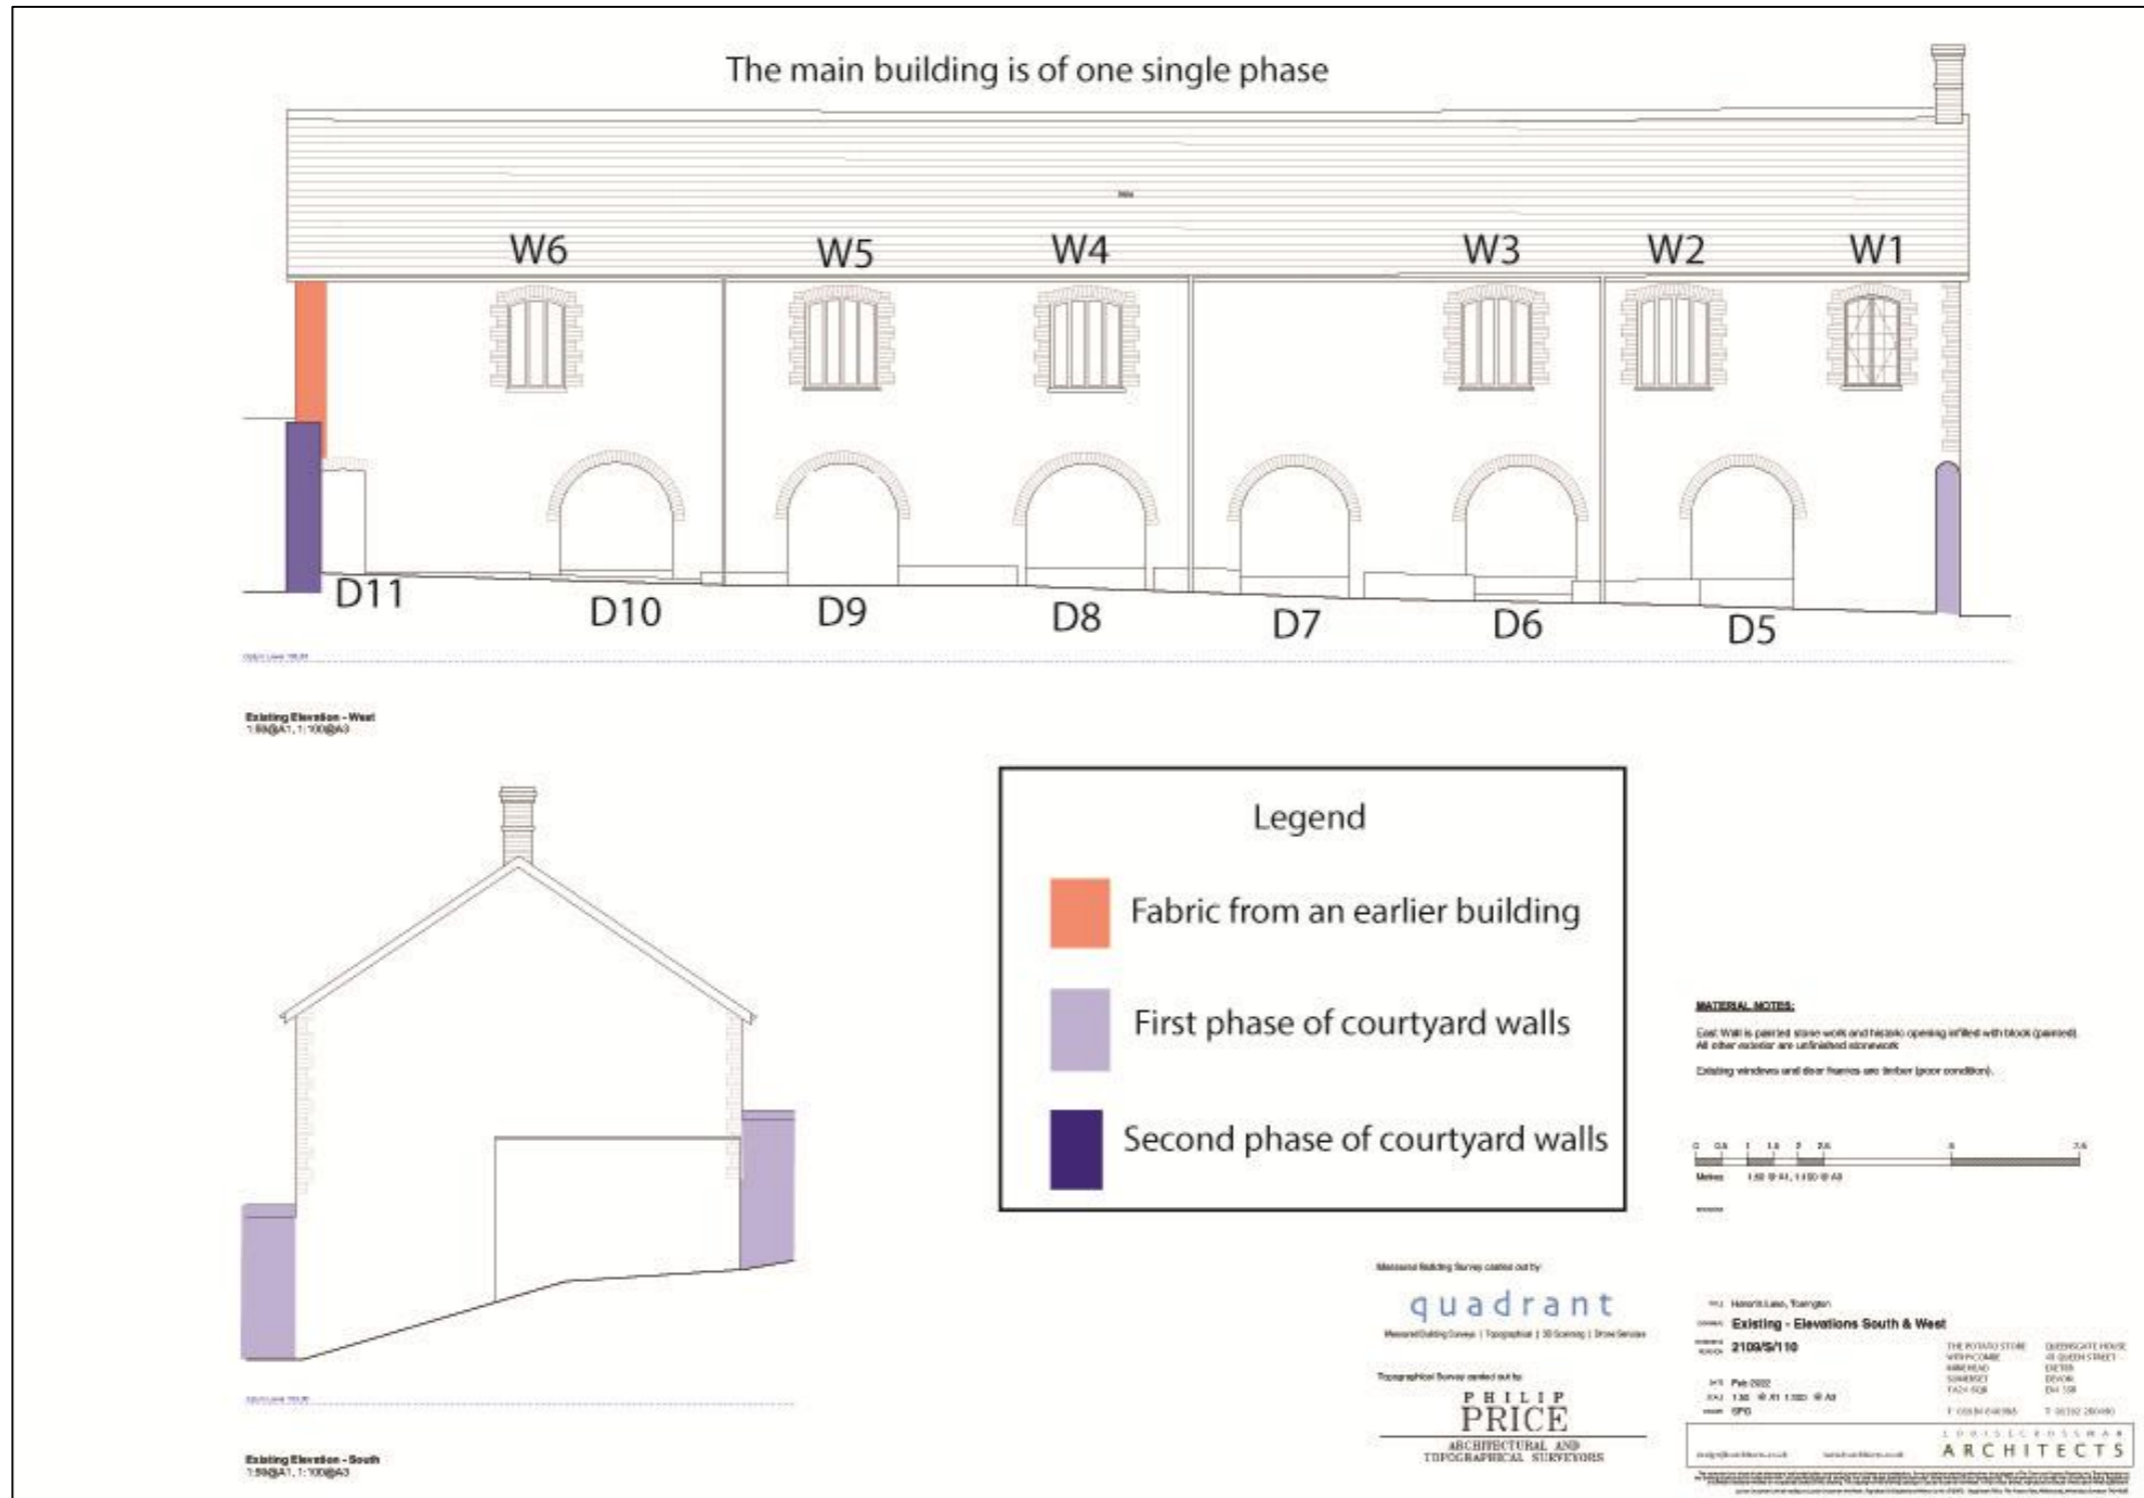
PHASED ELEVATIONS, WEST & SOUTH.
